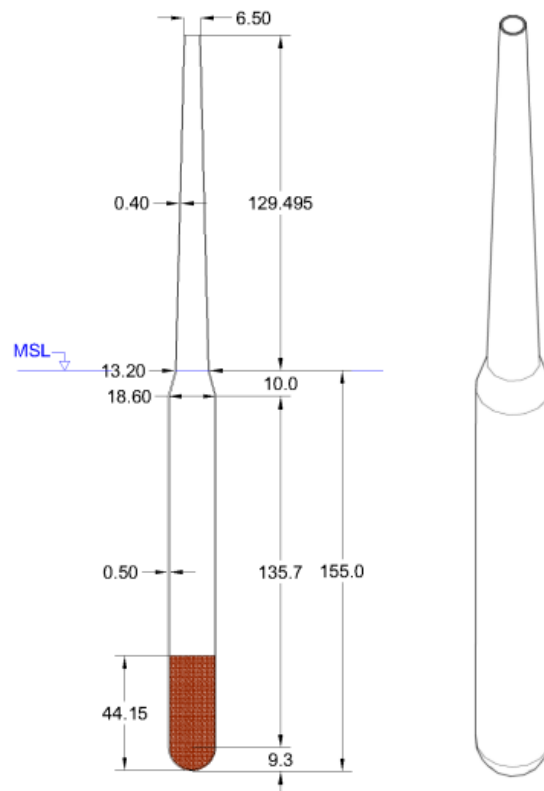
Arrangement and dimensions for the WindCrete Tower and Spar floater [7]
